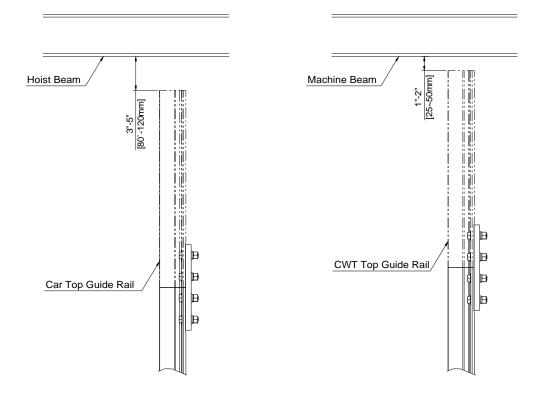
C. TOP GUIDE RAIL ASSEMBLY
